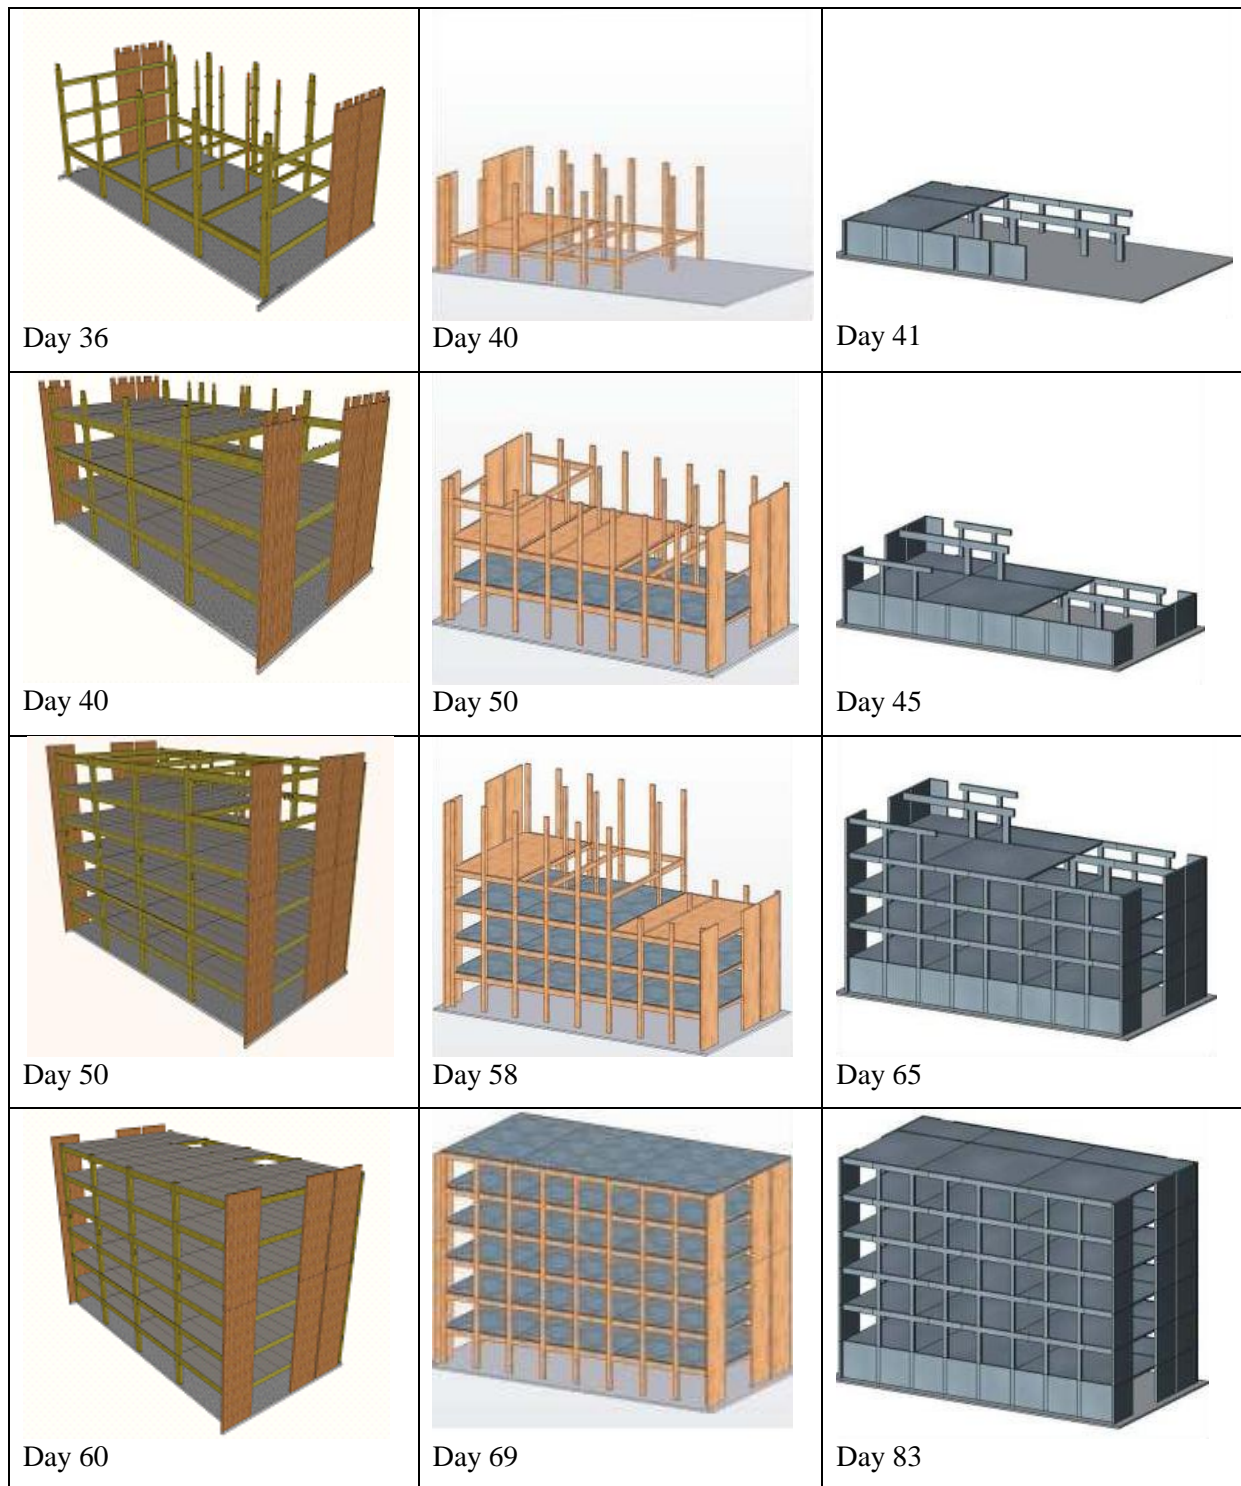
Structural erection time comparison- (left) Pres-Lam building (middle) source from Smith (2008) Timber building. (Right) Construction programme for concrete structural. (Revised)
